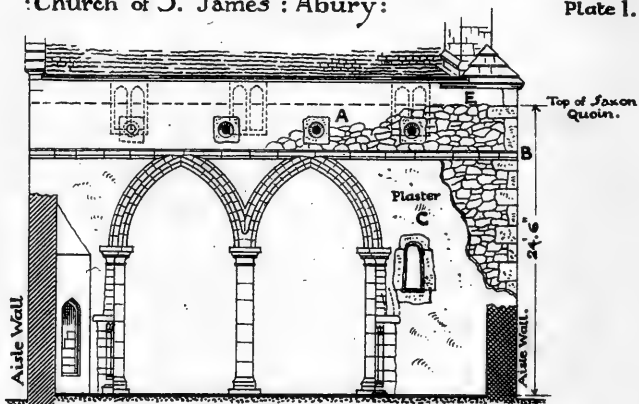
ELEVATION OF NORTH SIDE OF NAVE
